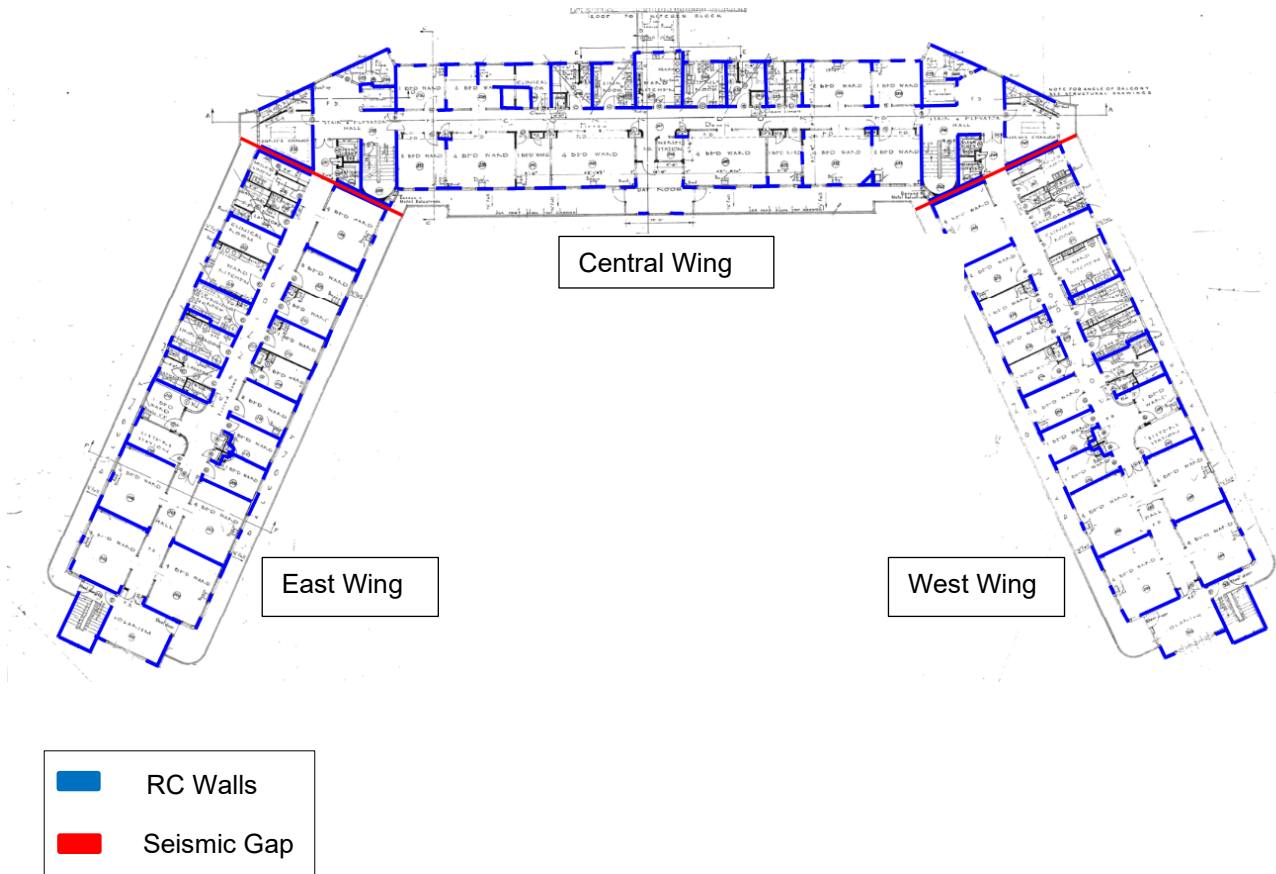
Plan View: Typical floor plan showing the RC walls and seismic gaps
